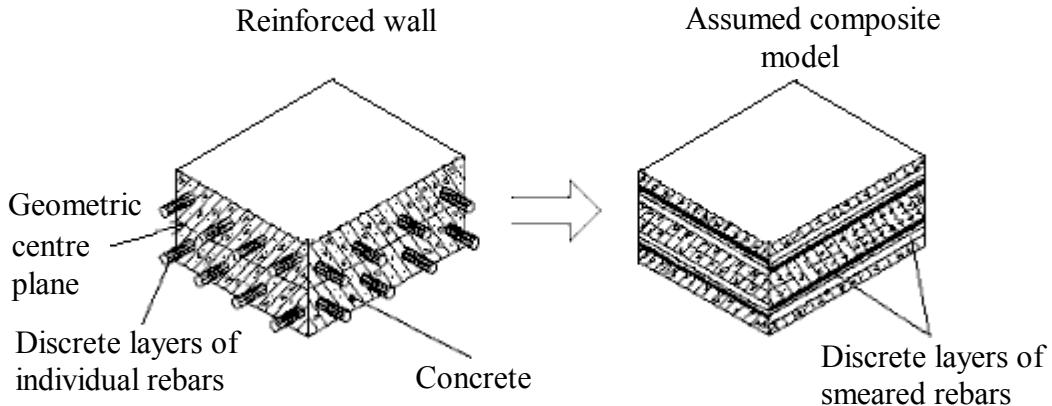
Section through wall/slab and equivalent finite element model with distinct layers of smeared reinforcing bars
